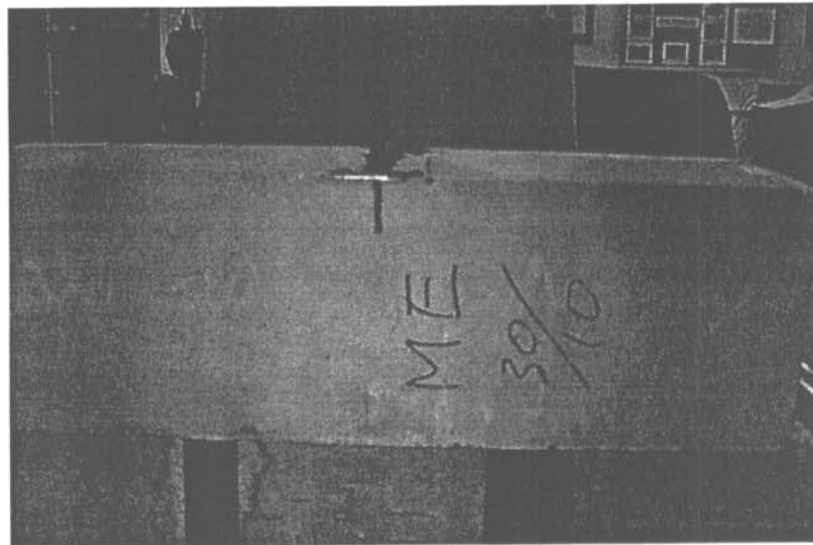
Notched rectangular concrete beam with epoxy filled inside the notch.
